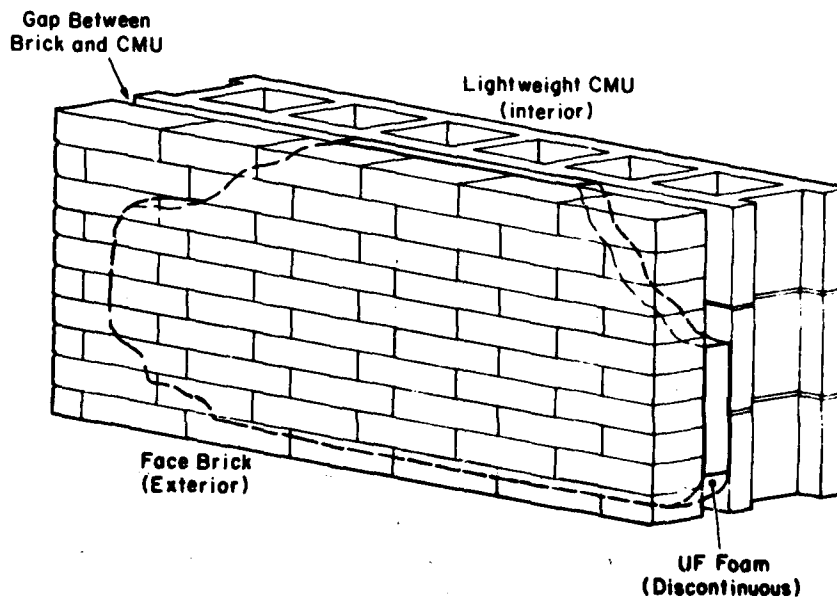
Configuration of masonry wall studied. Webs in concrete blocks and masonry ties divert heat flow from a path perpendicular to the construction.
